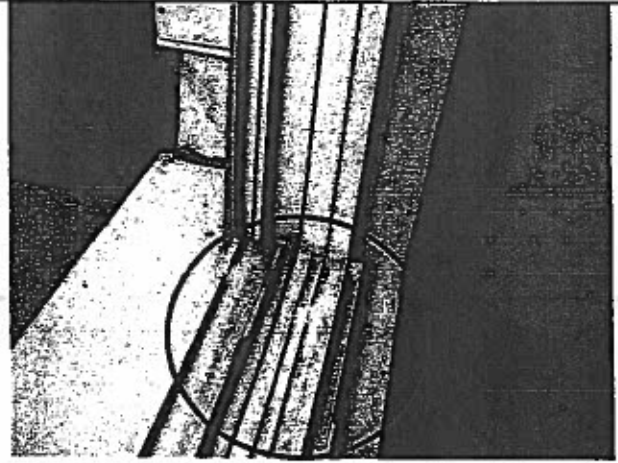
Unit #108 Level 1 patio sliding door showing heavy water staining and lack of drainage at sill track.
